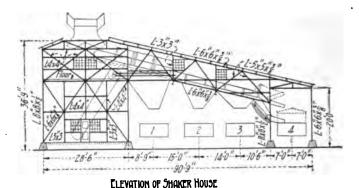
STEEL SHAKER BUILDING FOR COAL TIPPLE, FRANKLIN COUNTY CONSTRUCTION COMPANY.
